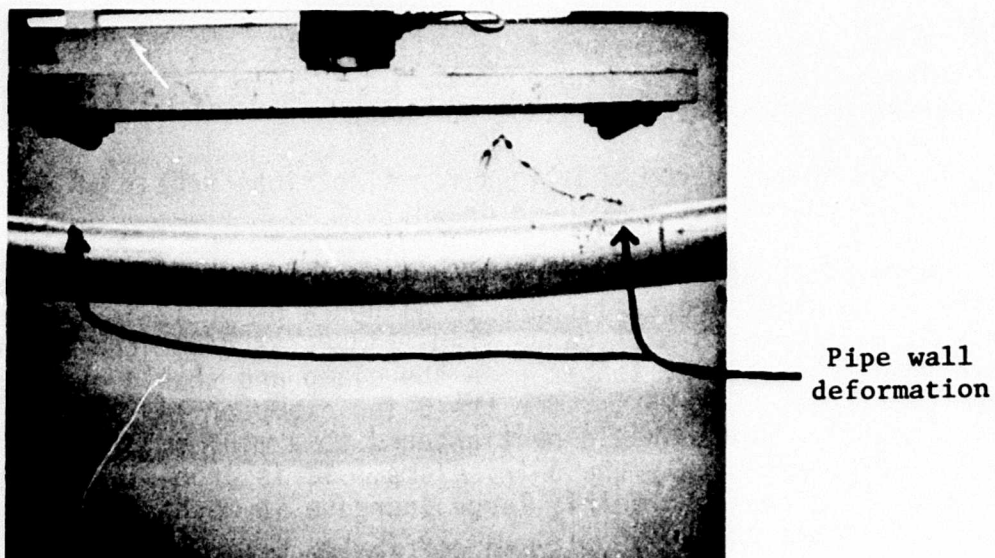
Side view of continuous conduit sample after lateral-stress test--showing conduit wall deformation.
